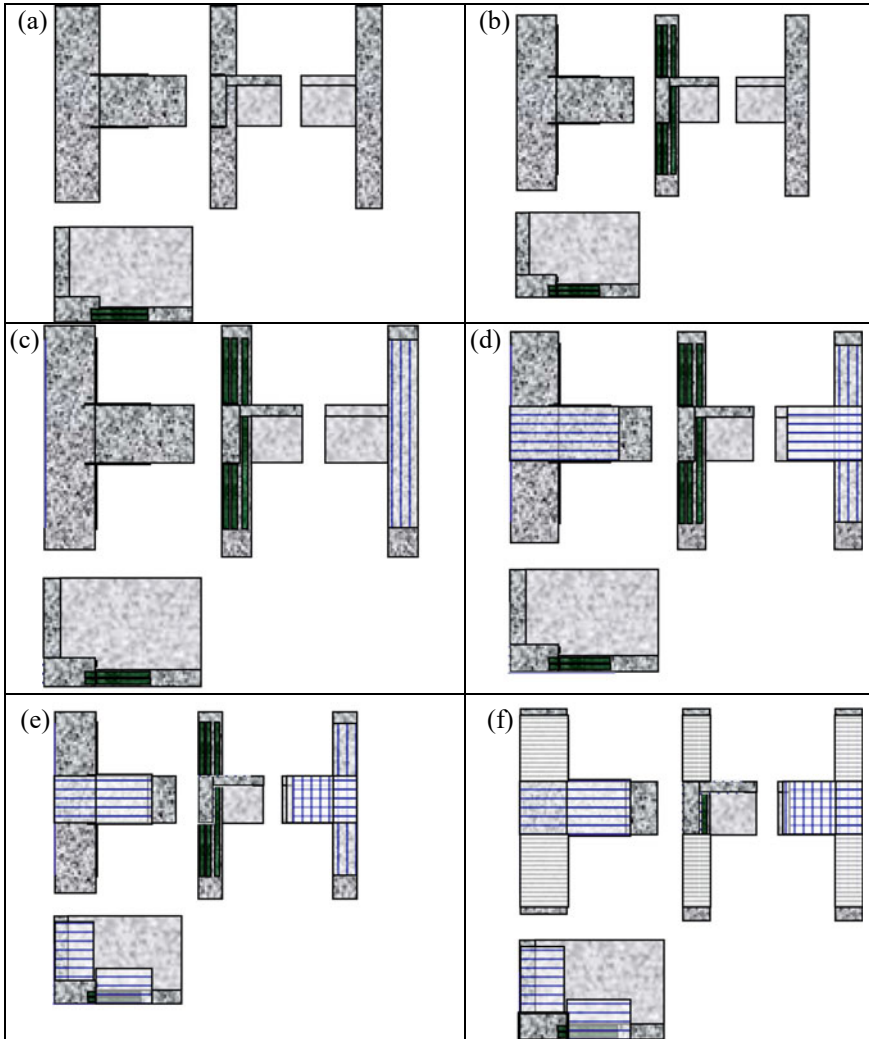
Details of FRP retrofitting of various elements of RCC structure
